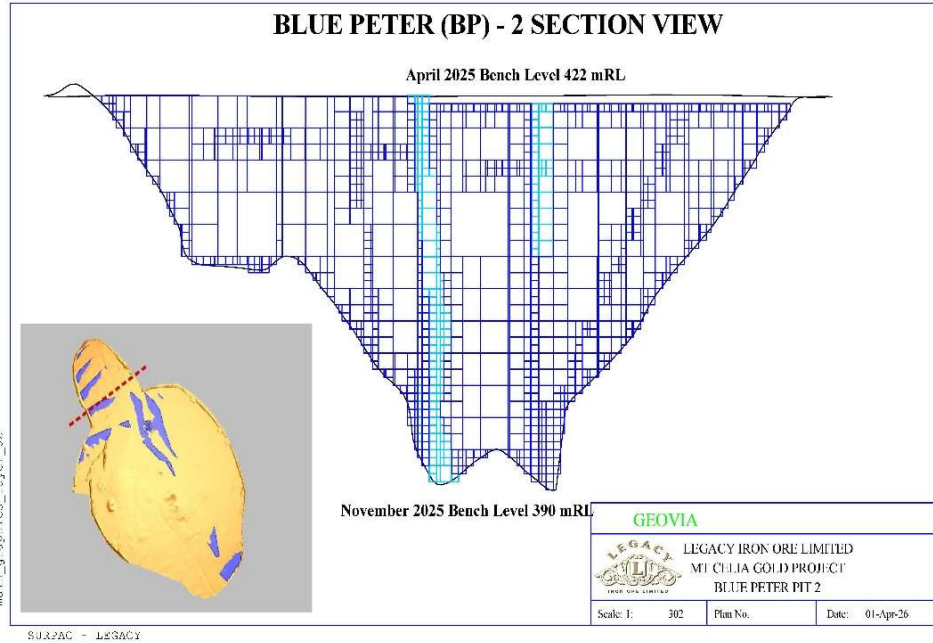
As built Sectional view of Blue Peter (BP- 2) pit.
